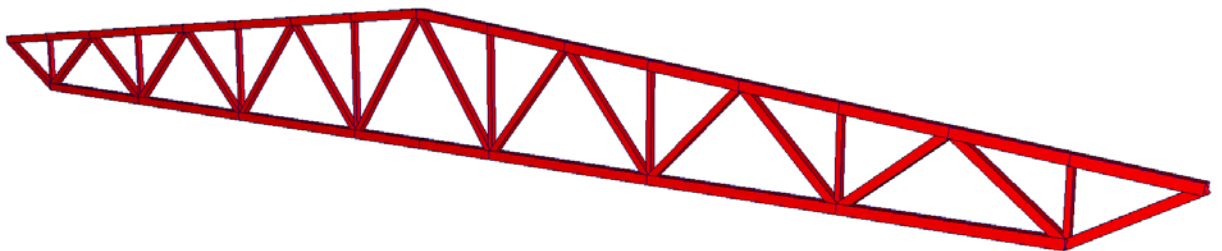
3d view of the 24-meters truss analytical scheme in SCAD Office
